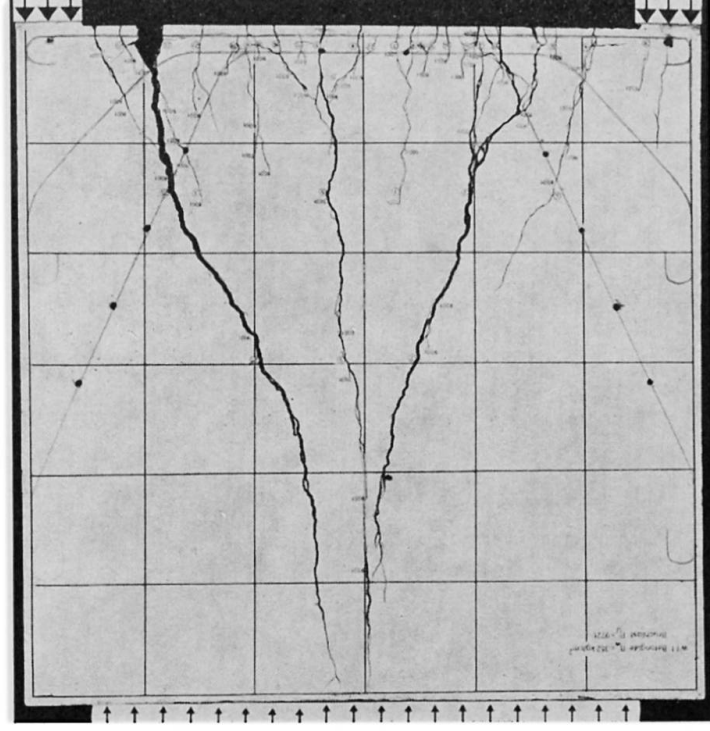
Crack pattern of continuous rectangular beam with web reinforcement.
